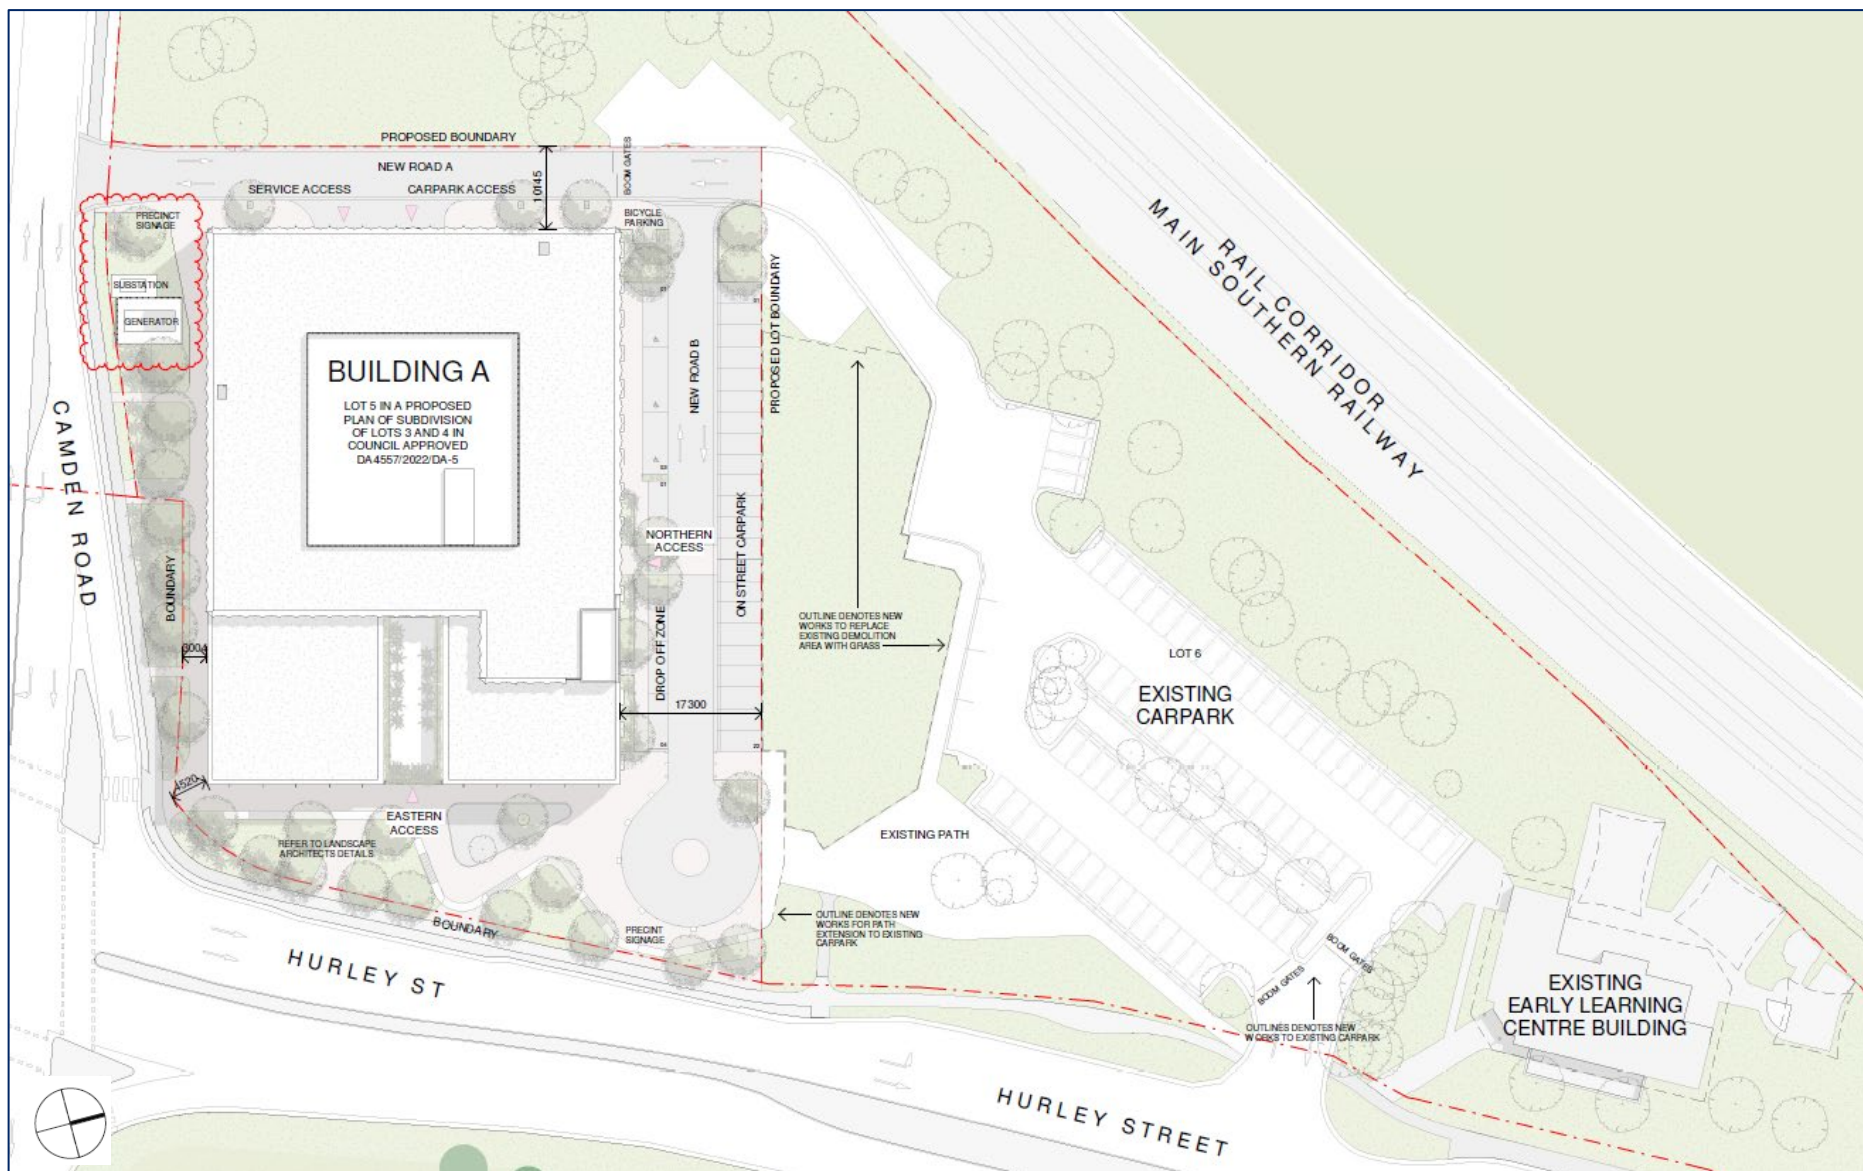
| Proposed landscape plan (Source: EIS, 2023).
